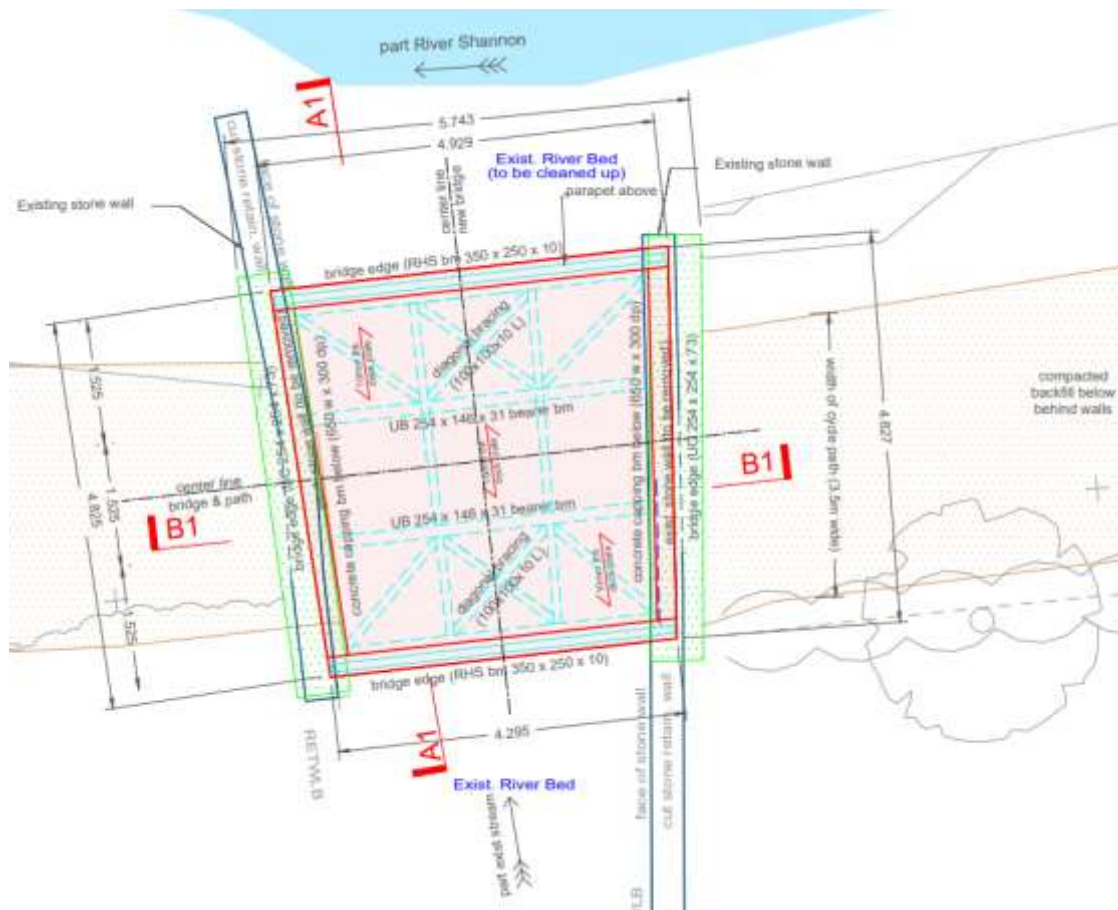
Proposed plan of Bridge 4 deck replacement
